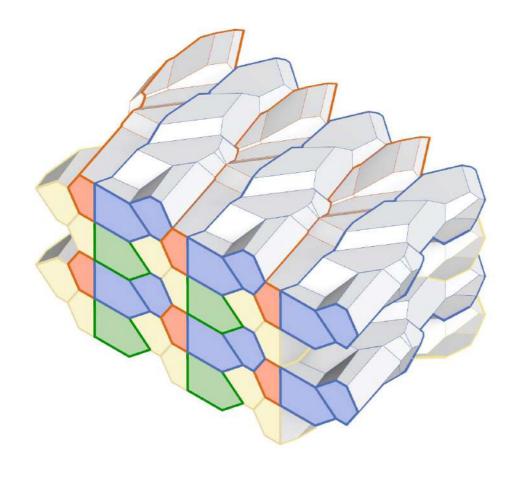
DETAIL SECTION - TYPICAL STRUCTURAL STRATEGY
